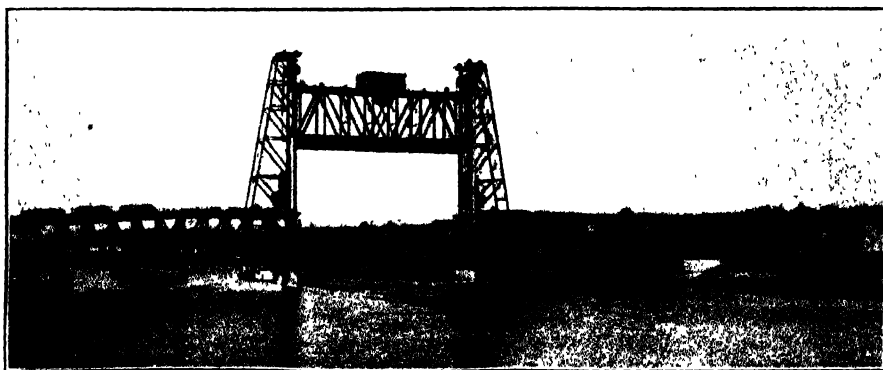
O.-W. R. R. and N. Co.'s Bridge over the Willamette River at Portland, Ore.—Lifting Deck and Lifting Span Up.
